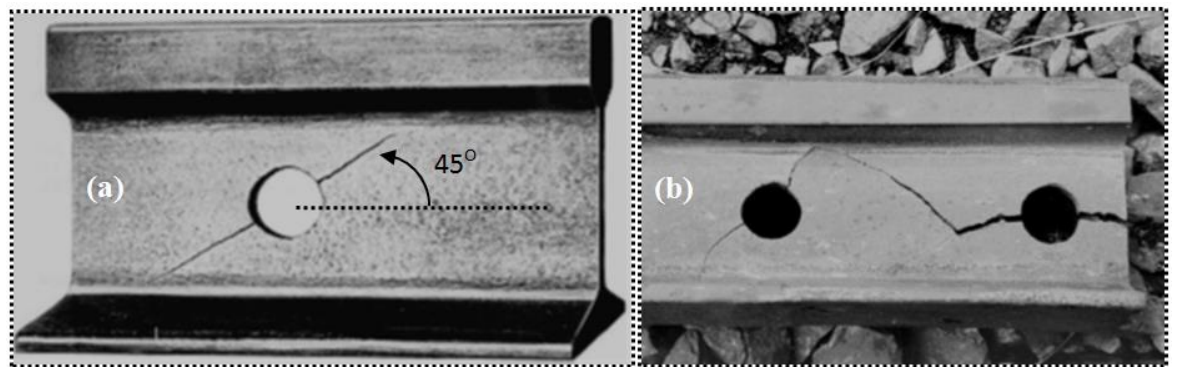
(a) Typical star crack and (b) horizontal crack for rail web bolt holes
